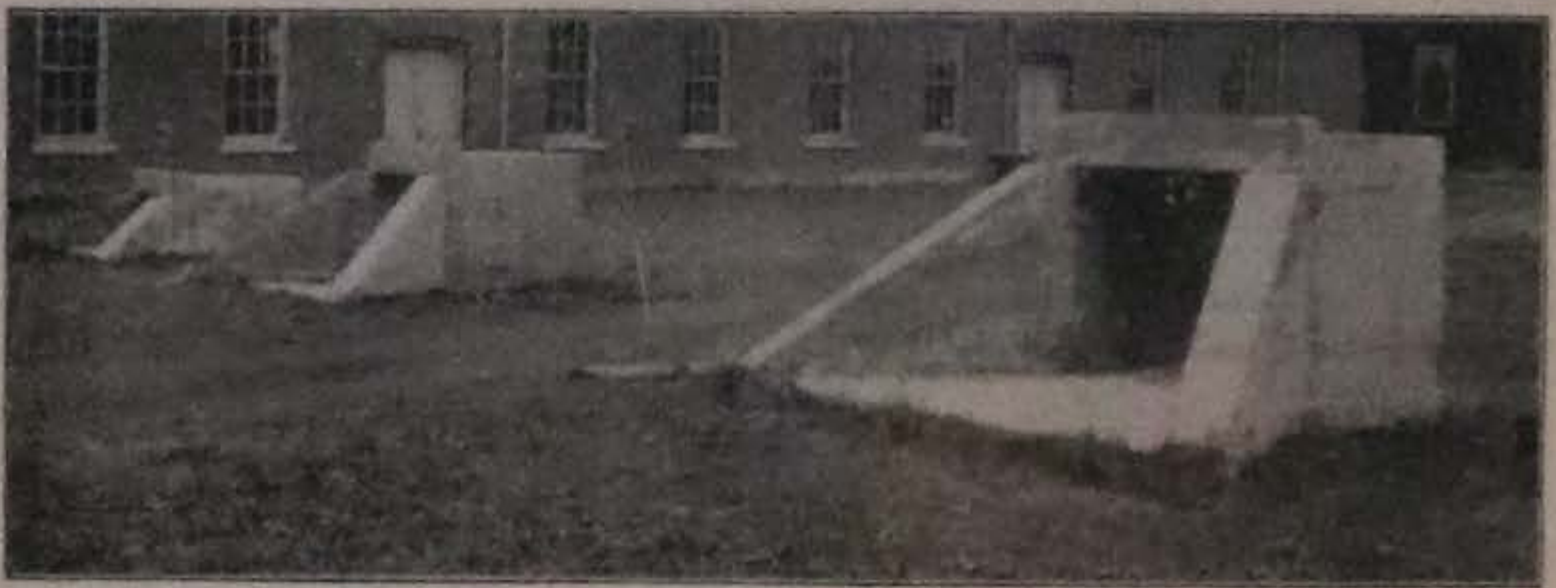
Test Culverts of Iowa Highway Commission, showing wing walls and short section of Culvert.
